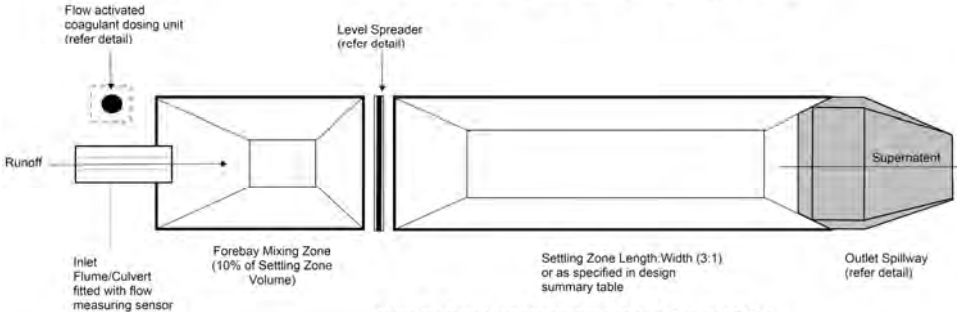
DETAILS AND NOTES ON CONSTRUCTION OF TYPE B BASINS ON THIS SHEET TAKEN FROM WWW.TURBID.COM.AU
